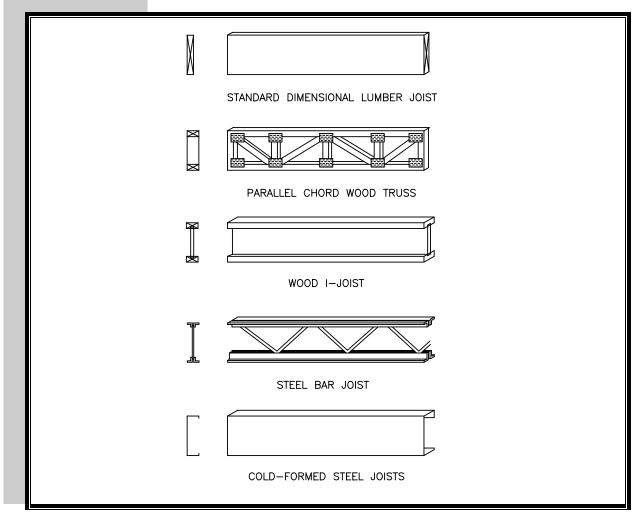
Conventional and Alternative Floor Framing Members
